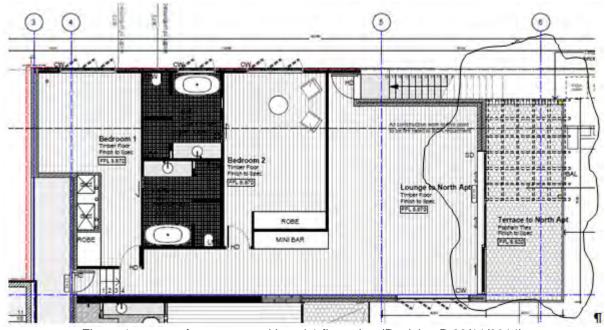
excerpt from proposed Level 1 floor plan (Revision B 28/11/2014)
